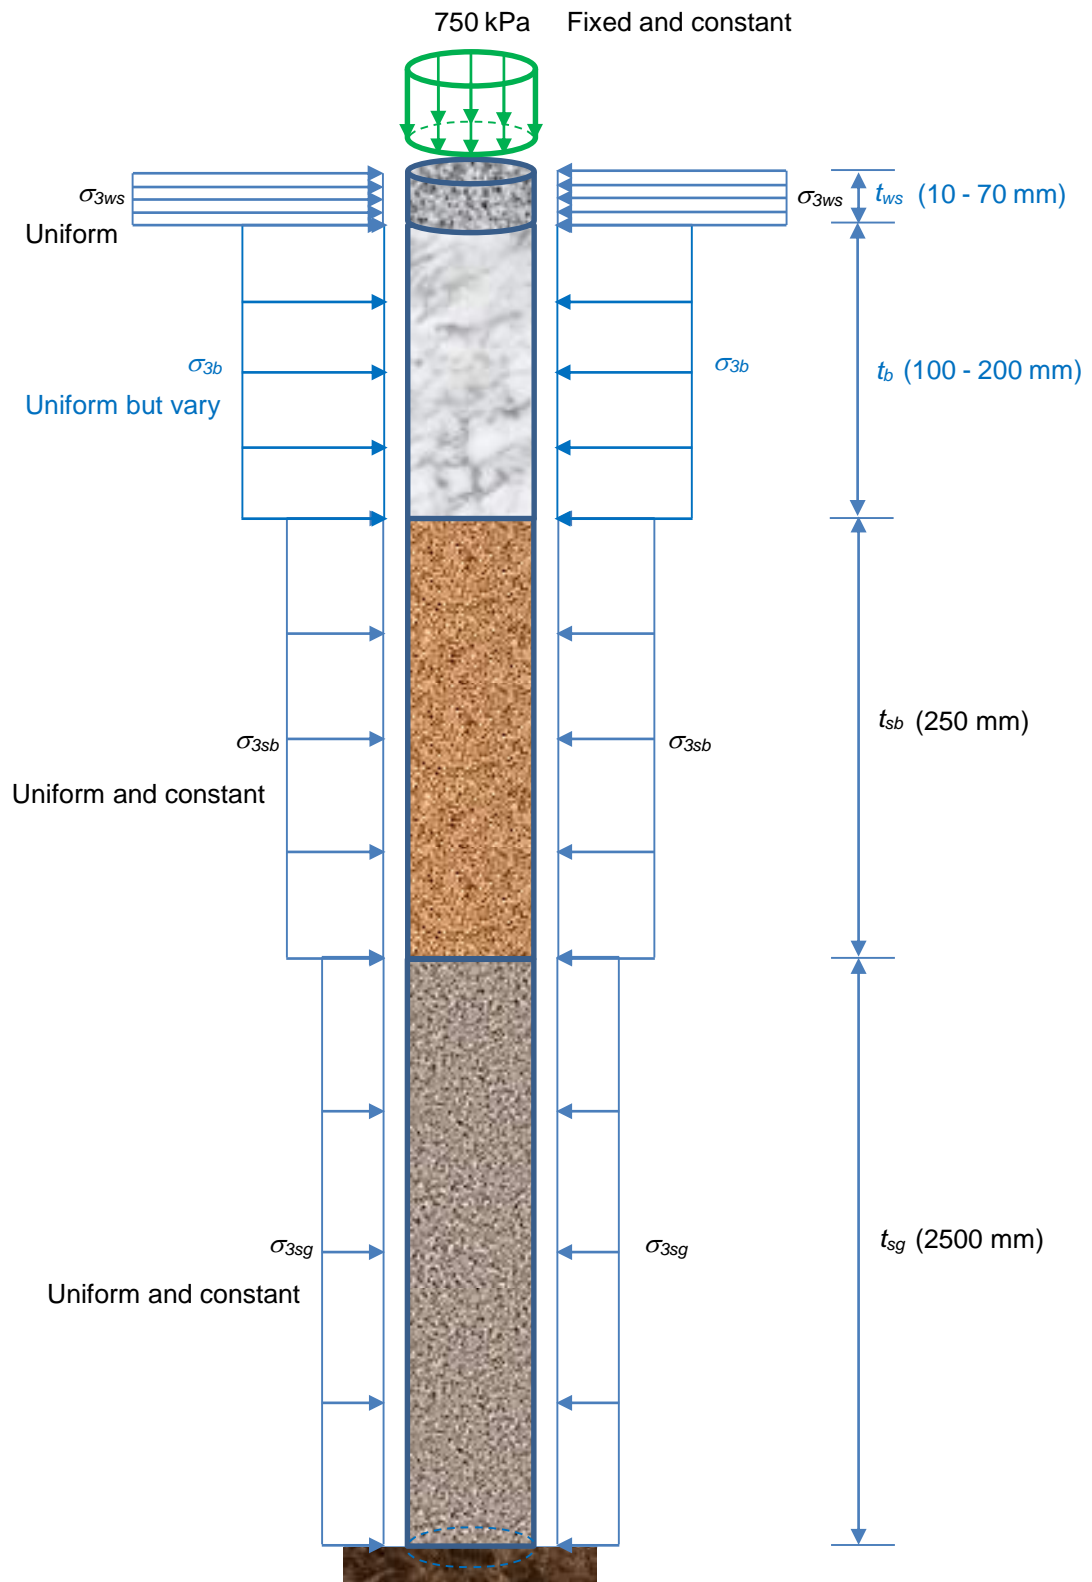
Column strip under a wheel of flexible pavement structure having thin asphalt concrete layer
